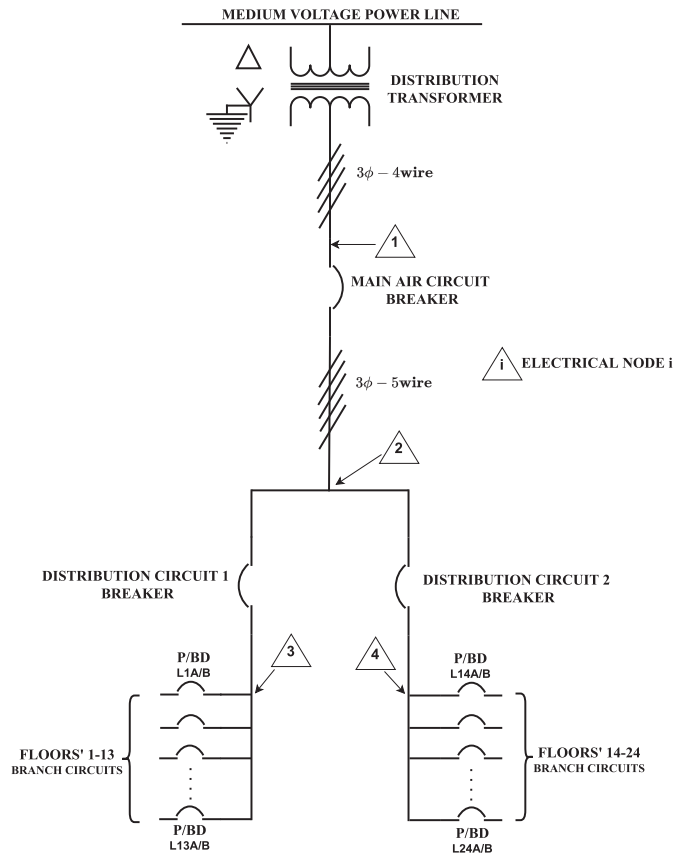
Electrical circuit diagram of a 24-floor high-rise apartment building on MIT campus.
